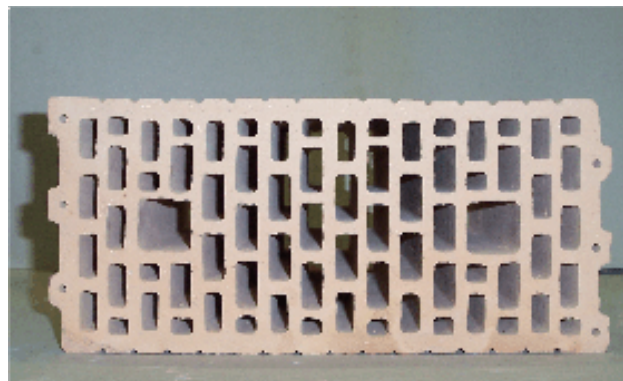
Typical clay unit for loadbearing walls in central Europe (HLzB)
